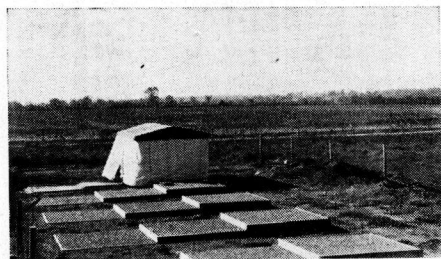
Layout of Base Sections in Warsaw Test Area. Testing rig with canvas canopy is shown on the far side of the test area.
